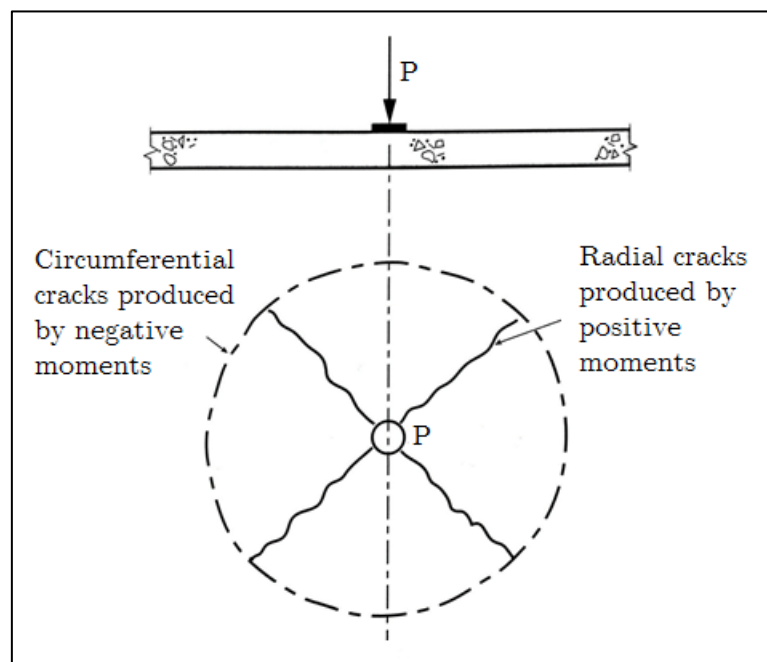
Development of radial and circumferential cracks in a concrete ground-supported slab (Concrete Society 2013)
